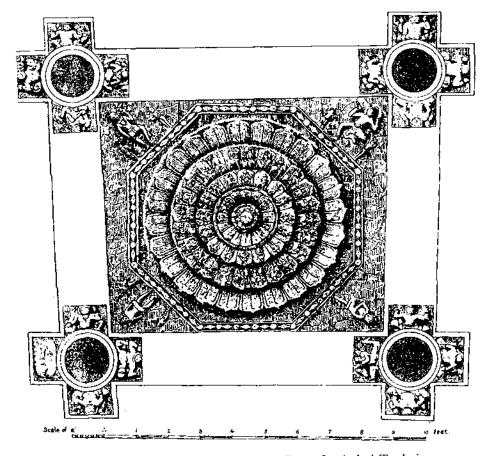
Hall Ceiling of Jaina Cave 3, Ankai-Tankai.
